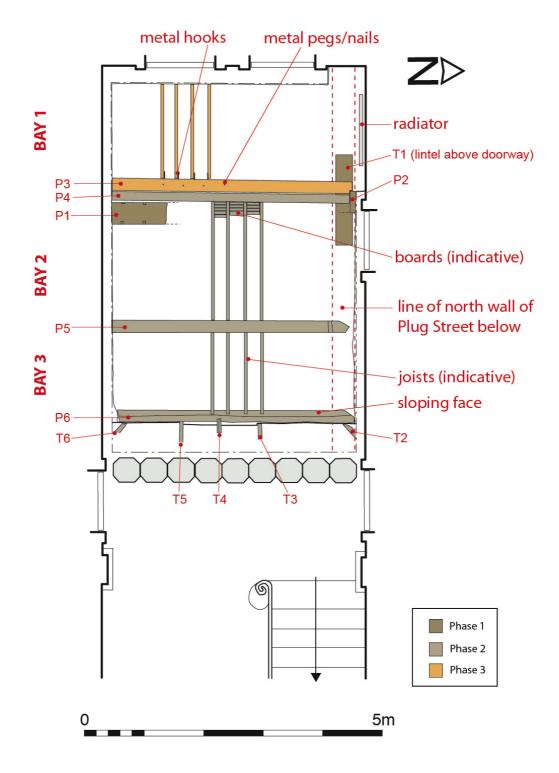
Layout of principal structural elements within exposed floor of East Corridor.
